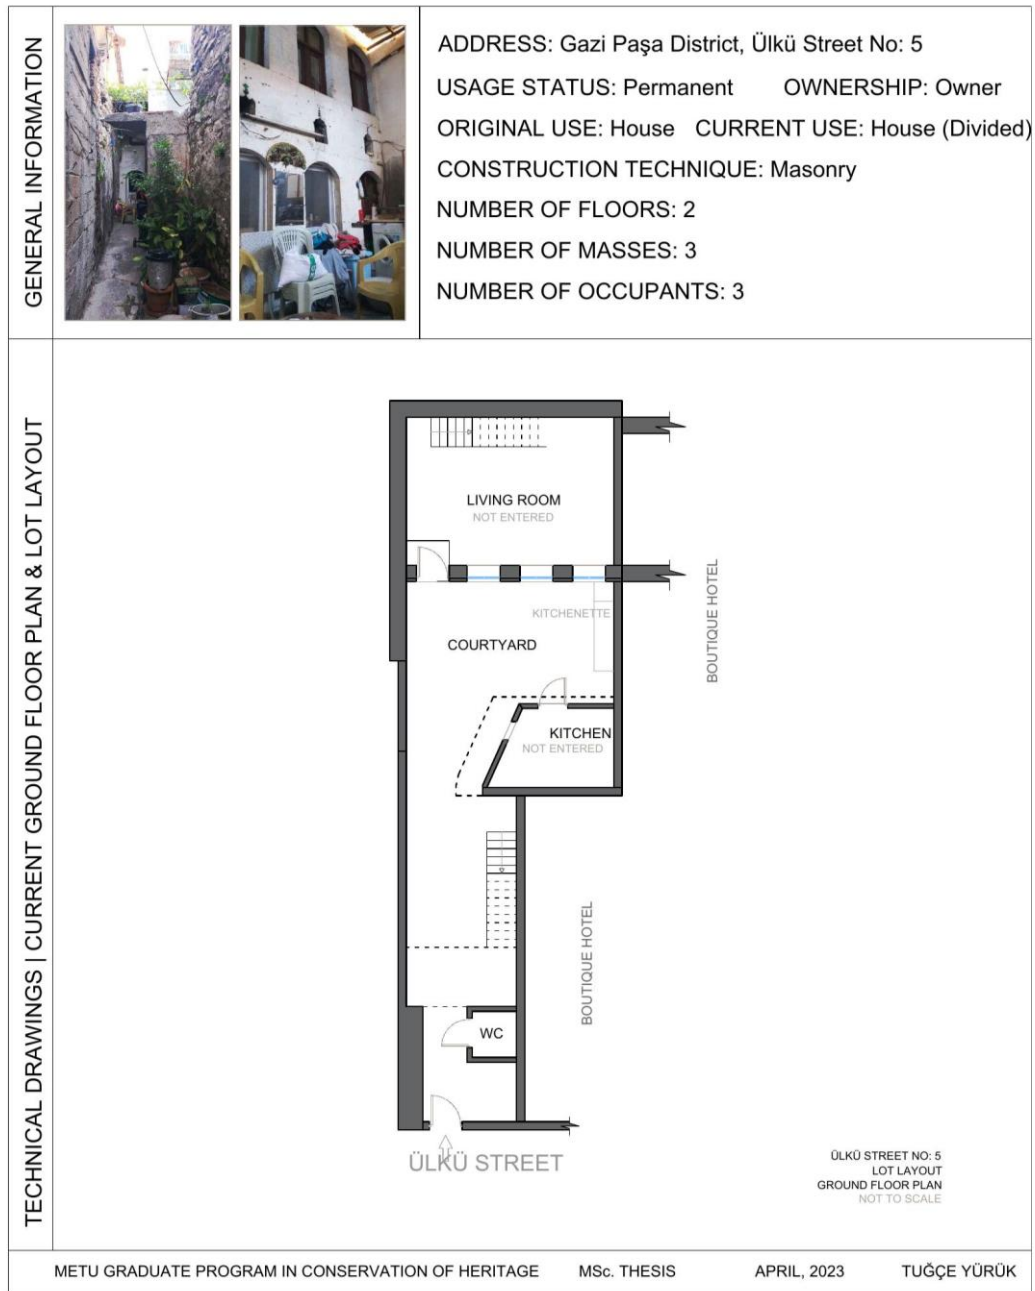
Current ground floor plan of Ülkü-5 House (Author, 2023)
